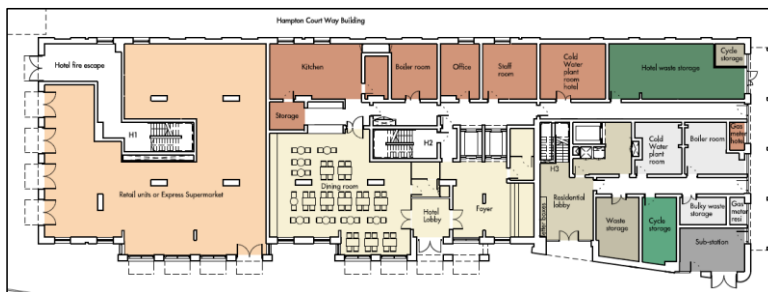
Proposed ground floor layout for the Hampton Court Way Building
